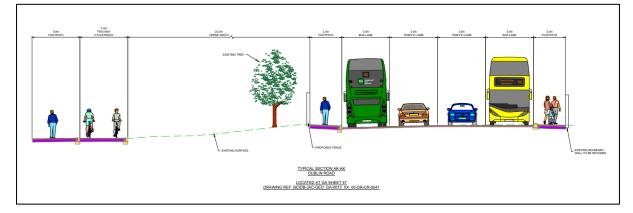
Extract from Typical Cross-section Drawings (Sheet 21)
